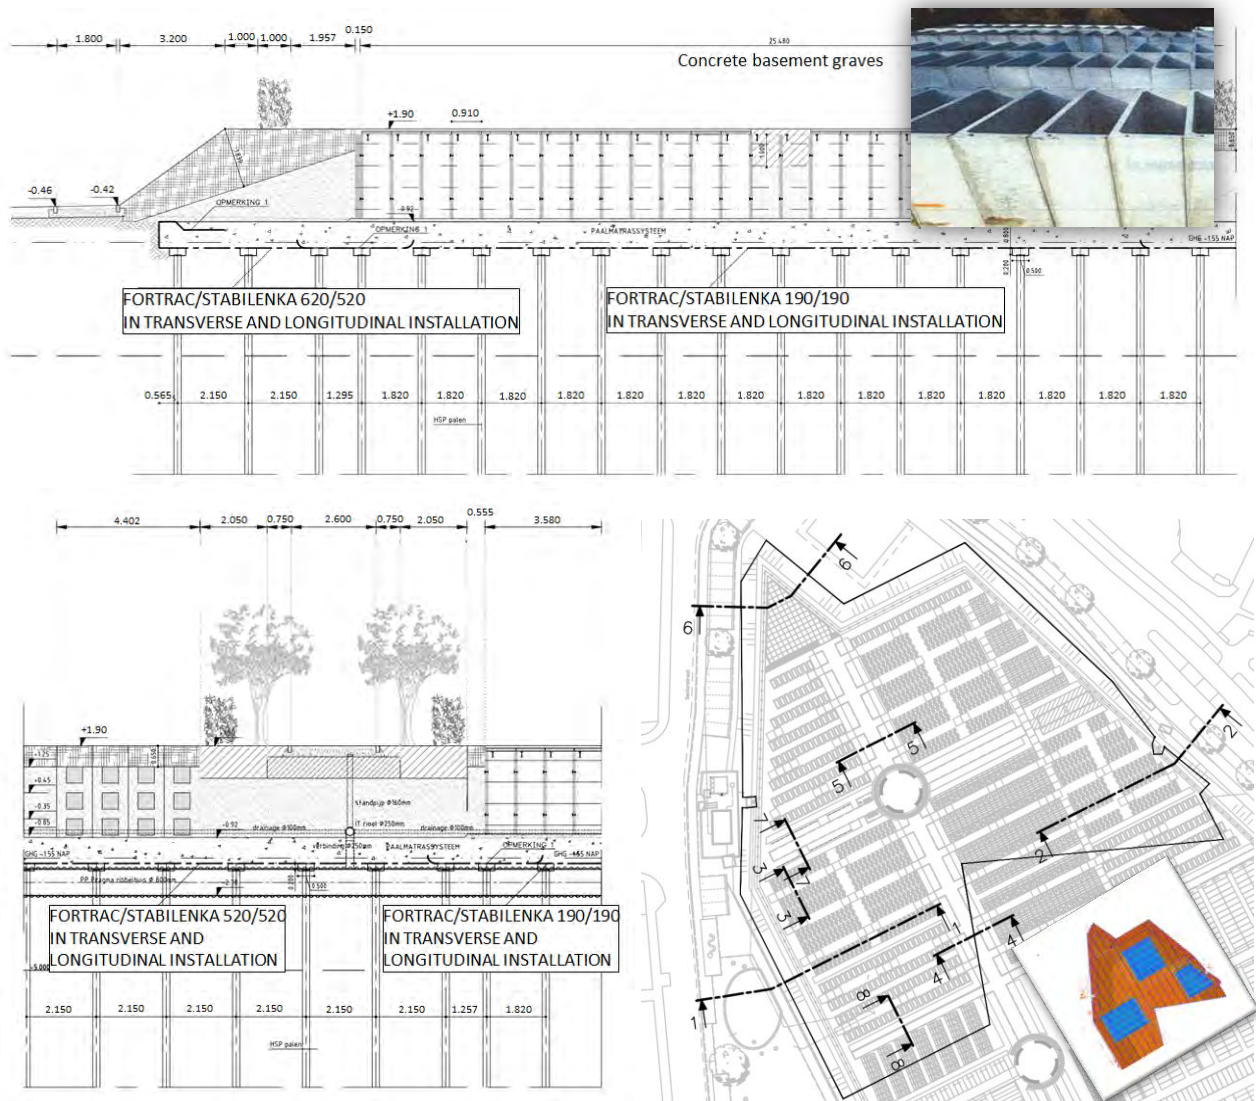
Two cross sections (1-1, upper & 5-5 lower) and plan view of cemetery with sand graves and tombs
